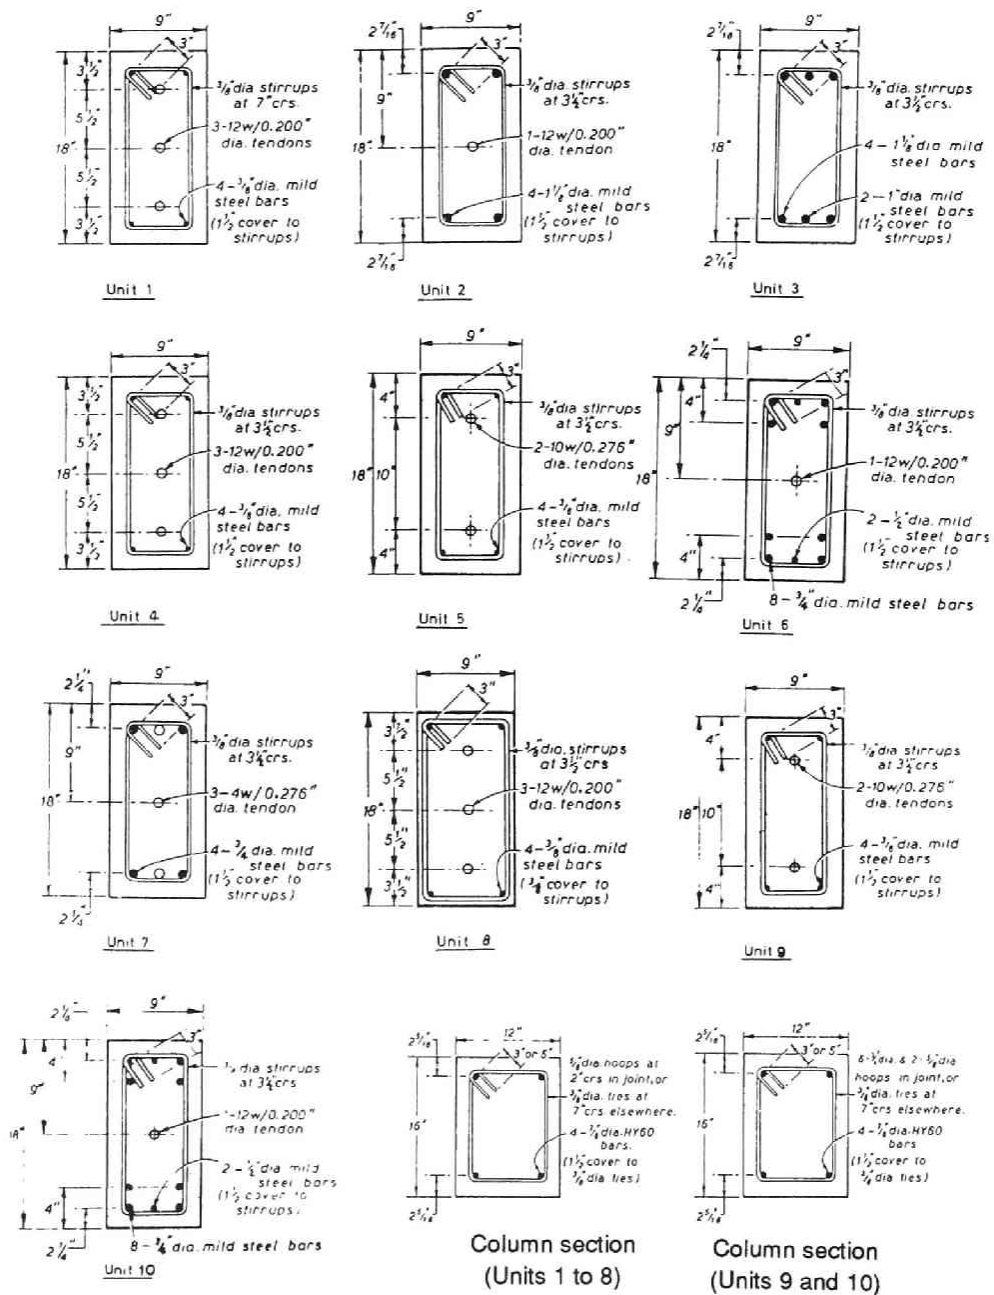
Beam and column cross sections with the steel details [4.6]
